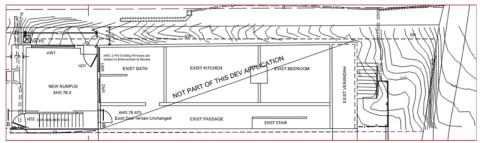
proposed ground floor plan (showing the location of the proposed rumpus) The roof of the proposed rumpus room will form the floor of the proposed deck
